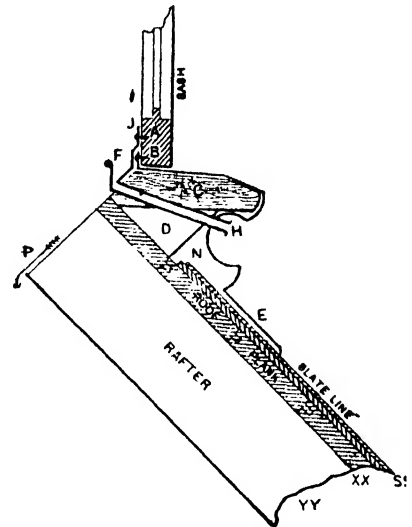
Enlarged View, Showing Fastening of Gutter in Fig. 255
